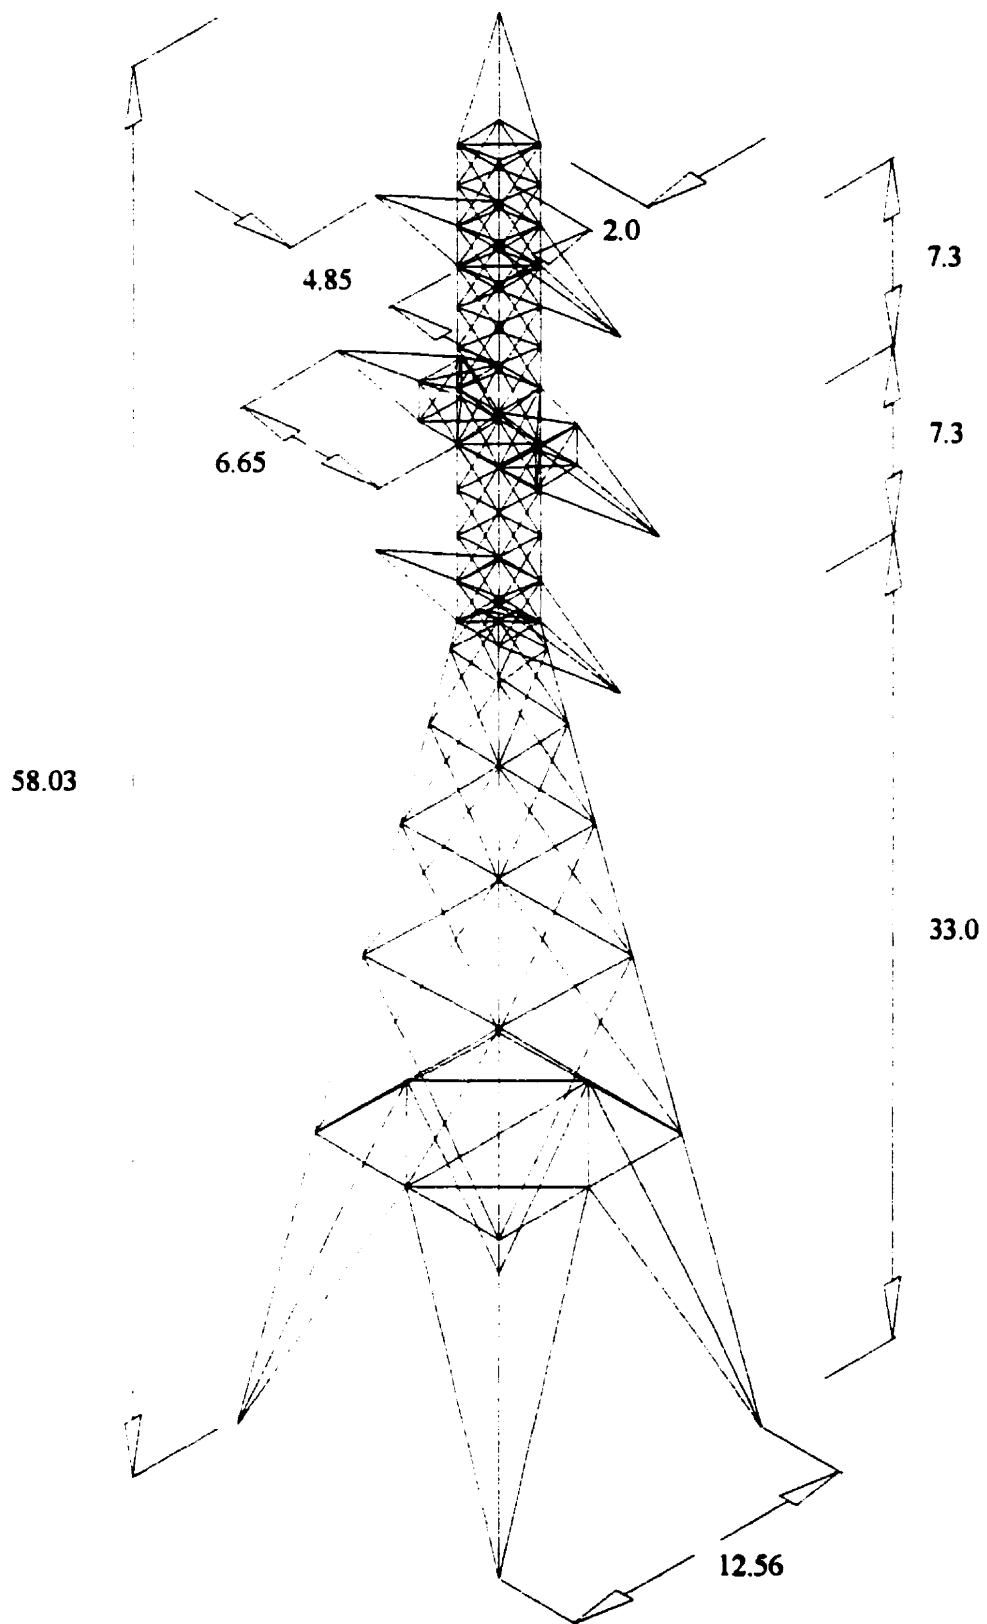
Layout of tower TR5 (dimensions are in m)
